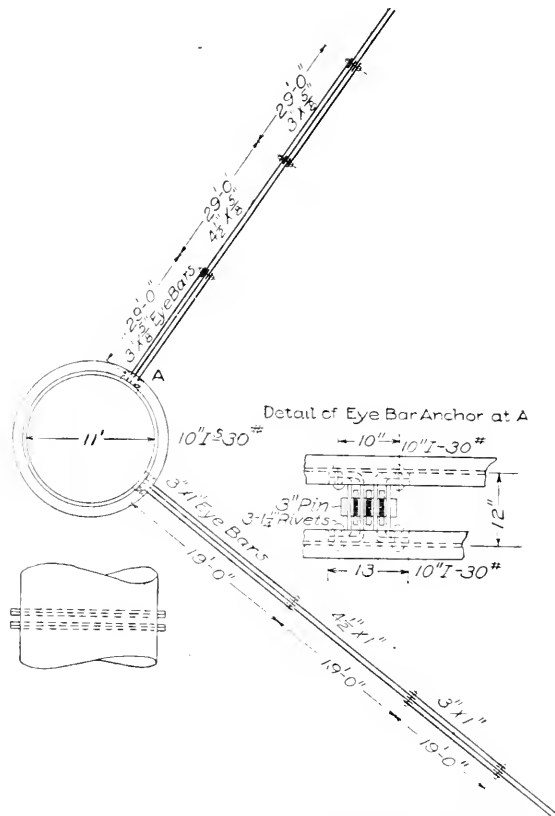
Anchor at Top of Penstock, Plant of Niagara Falls Hydraulic Power & Manufacturing Company.
